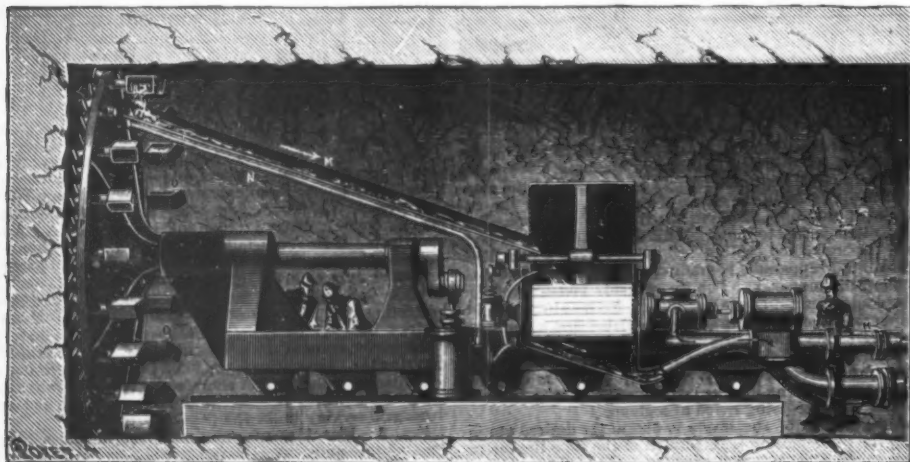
CRAMPTON'S HYDRAULIC TUNNELING MACHINE.
